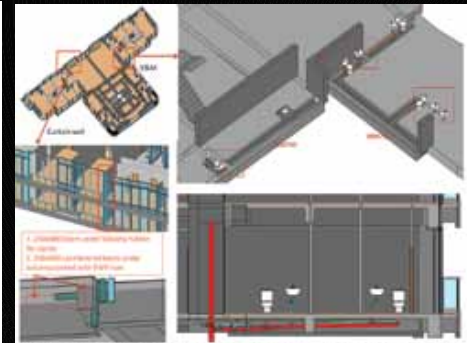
Design construction of structural & drainage system within curtain wall and outside window wall facade of main structure.
